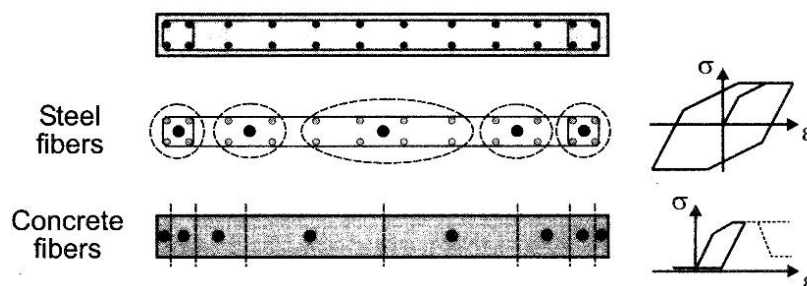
Fiber section for membrane behavior of a reinforced concrete wall (Modified from Powell [5])
